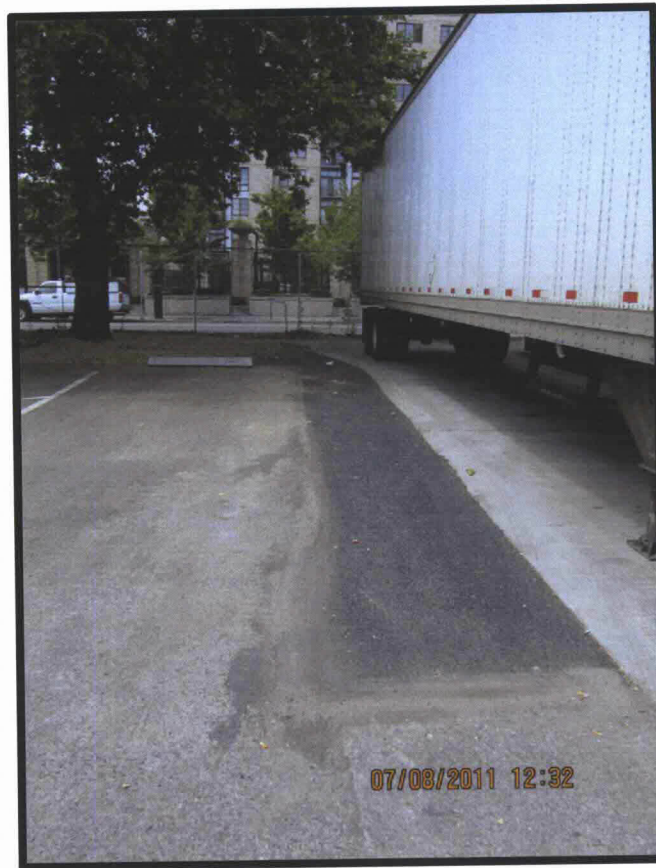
Looking westerly at pavement repair (former planter) and landscaping south of abandoned driveway in northwestern area.
